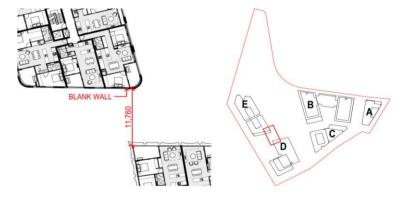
F1.1 Building D-E separation (storeys 1-2) & Key Plan
